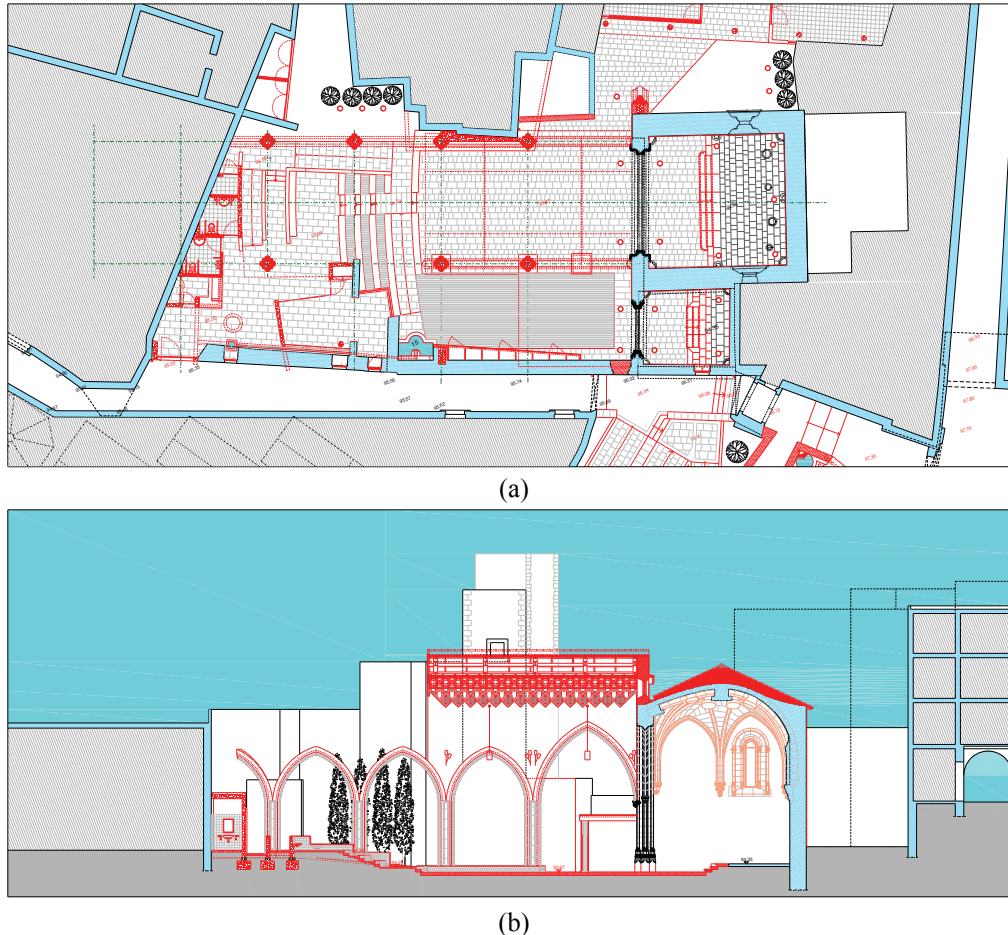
Architectural proposal: (a) plan; and (b) longitudinal section.
